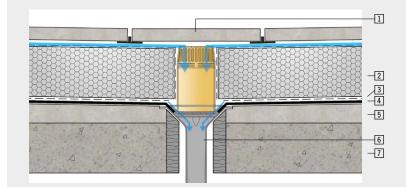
Ballasted inverted roof - outlet protected by paving slabs
